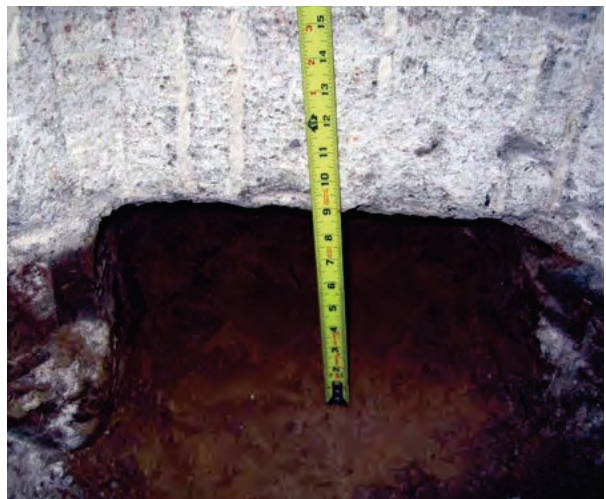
Completed footing excavation and preparation; ready to position bracket
